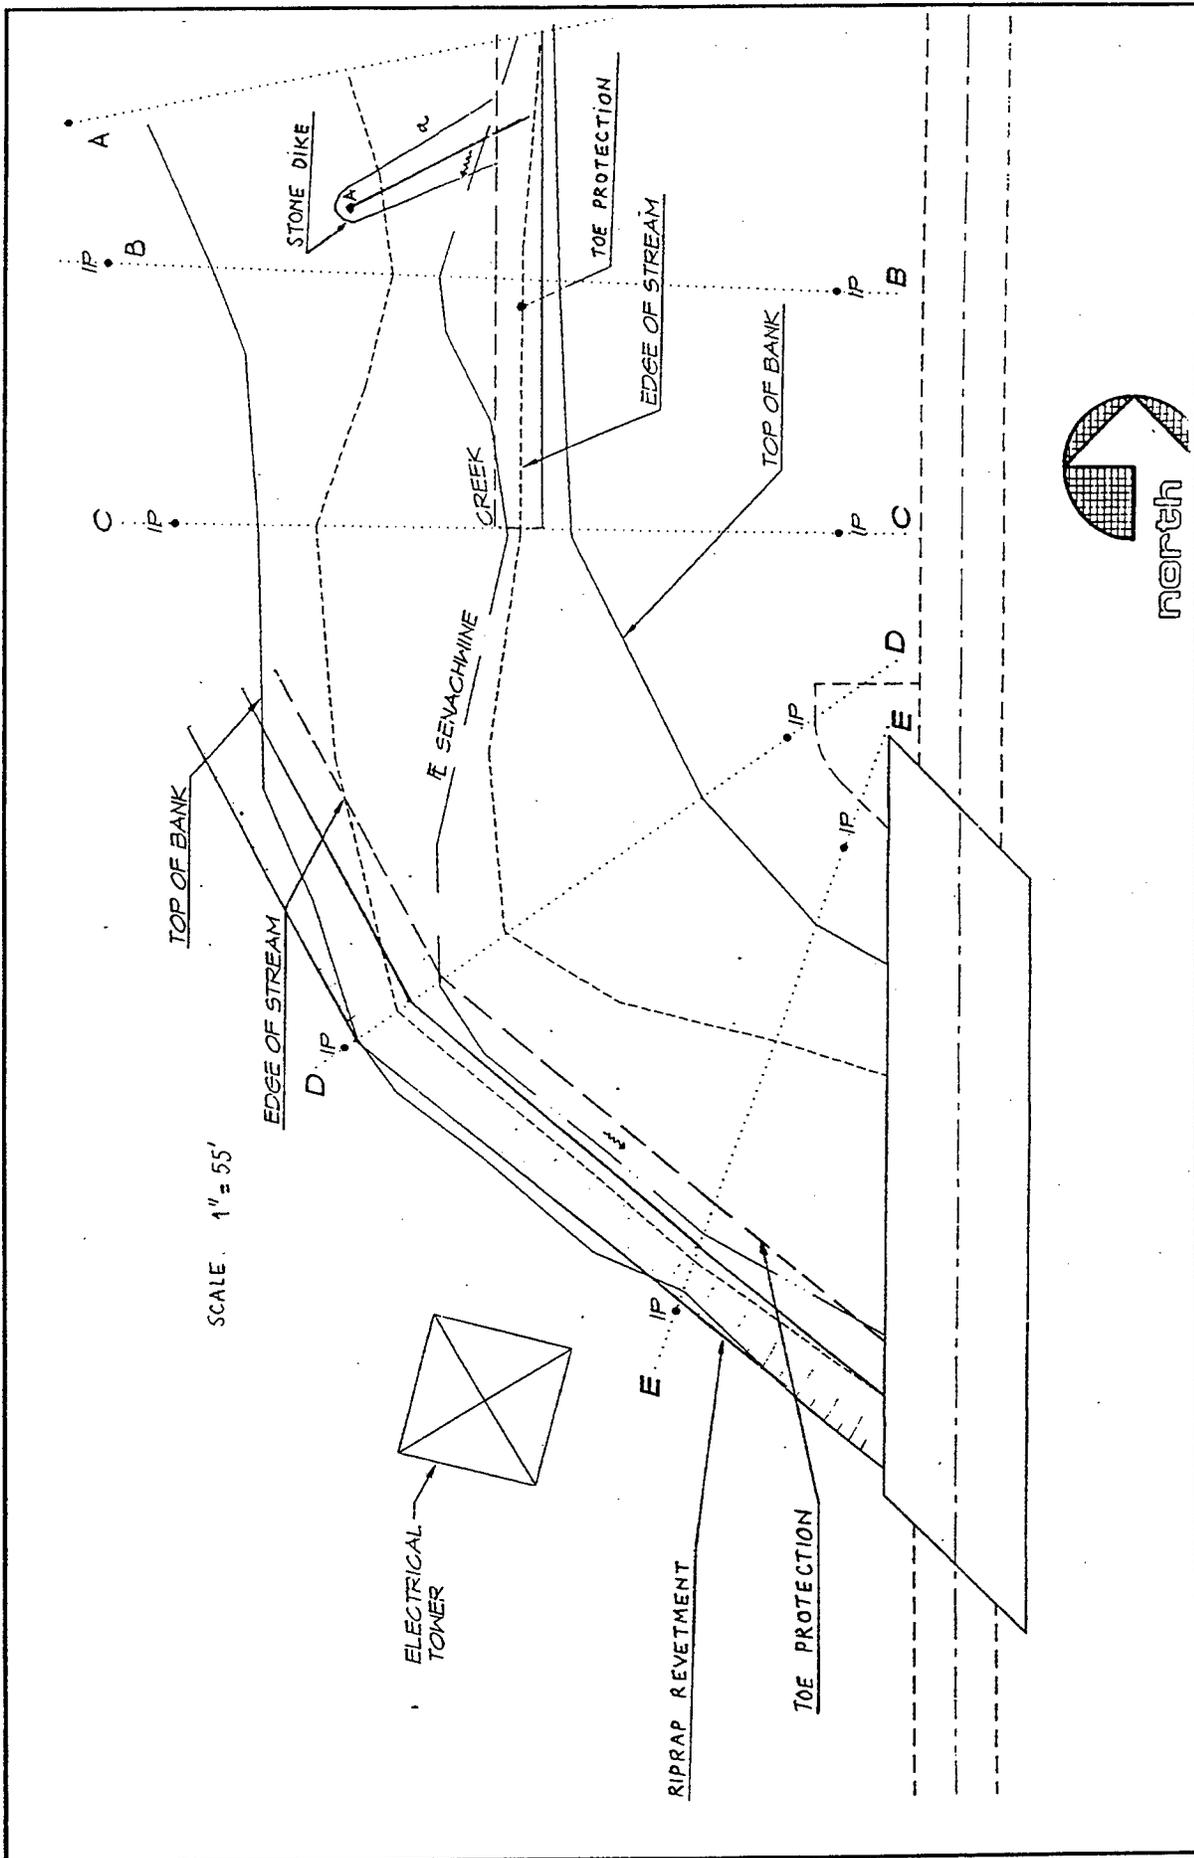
Senavachine Creek site alternative 1 design schematic (plan view).
